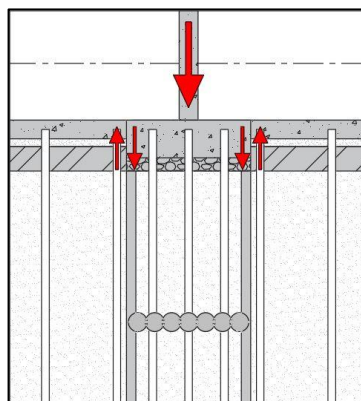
Shear forces between the connection of the existing structure and new one after loading.
